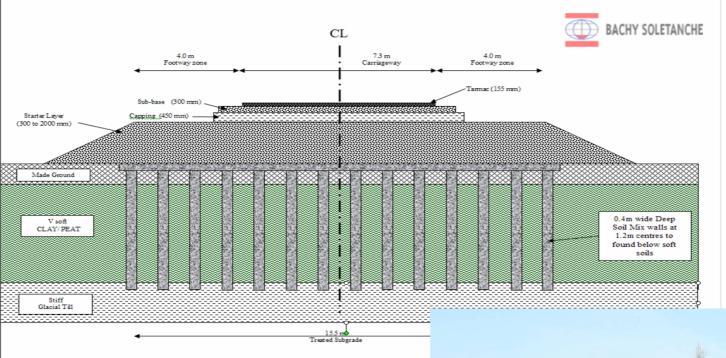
Proposed Pavement Foundation Solution (Scale 1:100)
